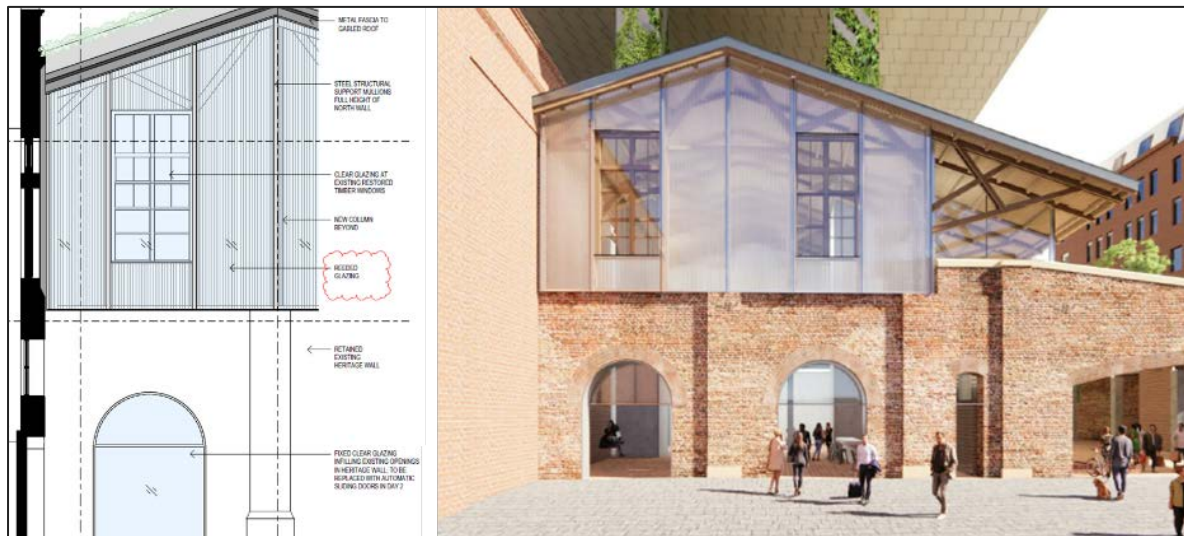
| Reconstructed northern (Ambulance Avenue) elevation of the IP Shed (Base source: Applicant's RtS)
